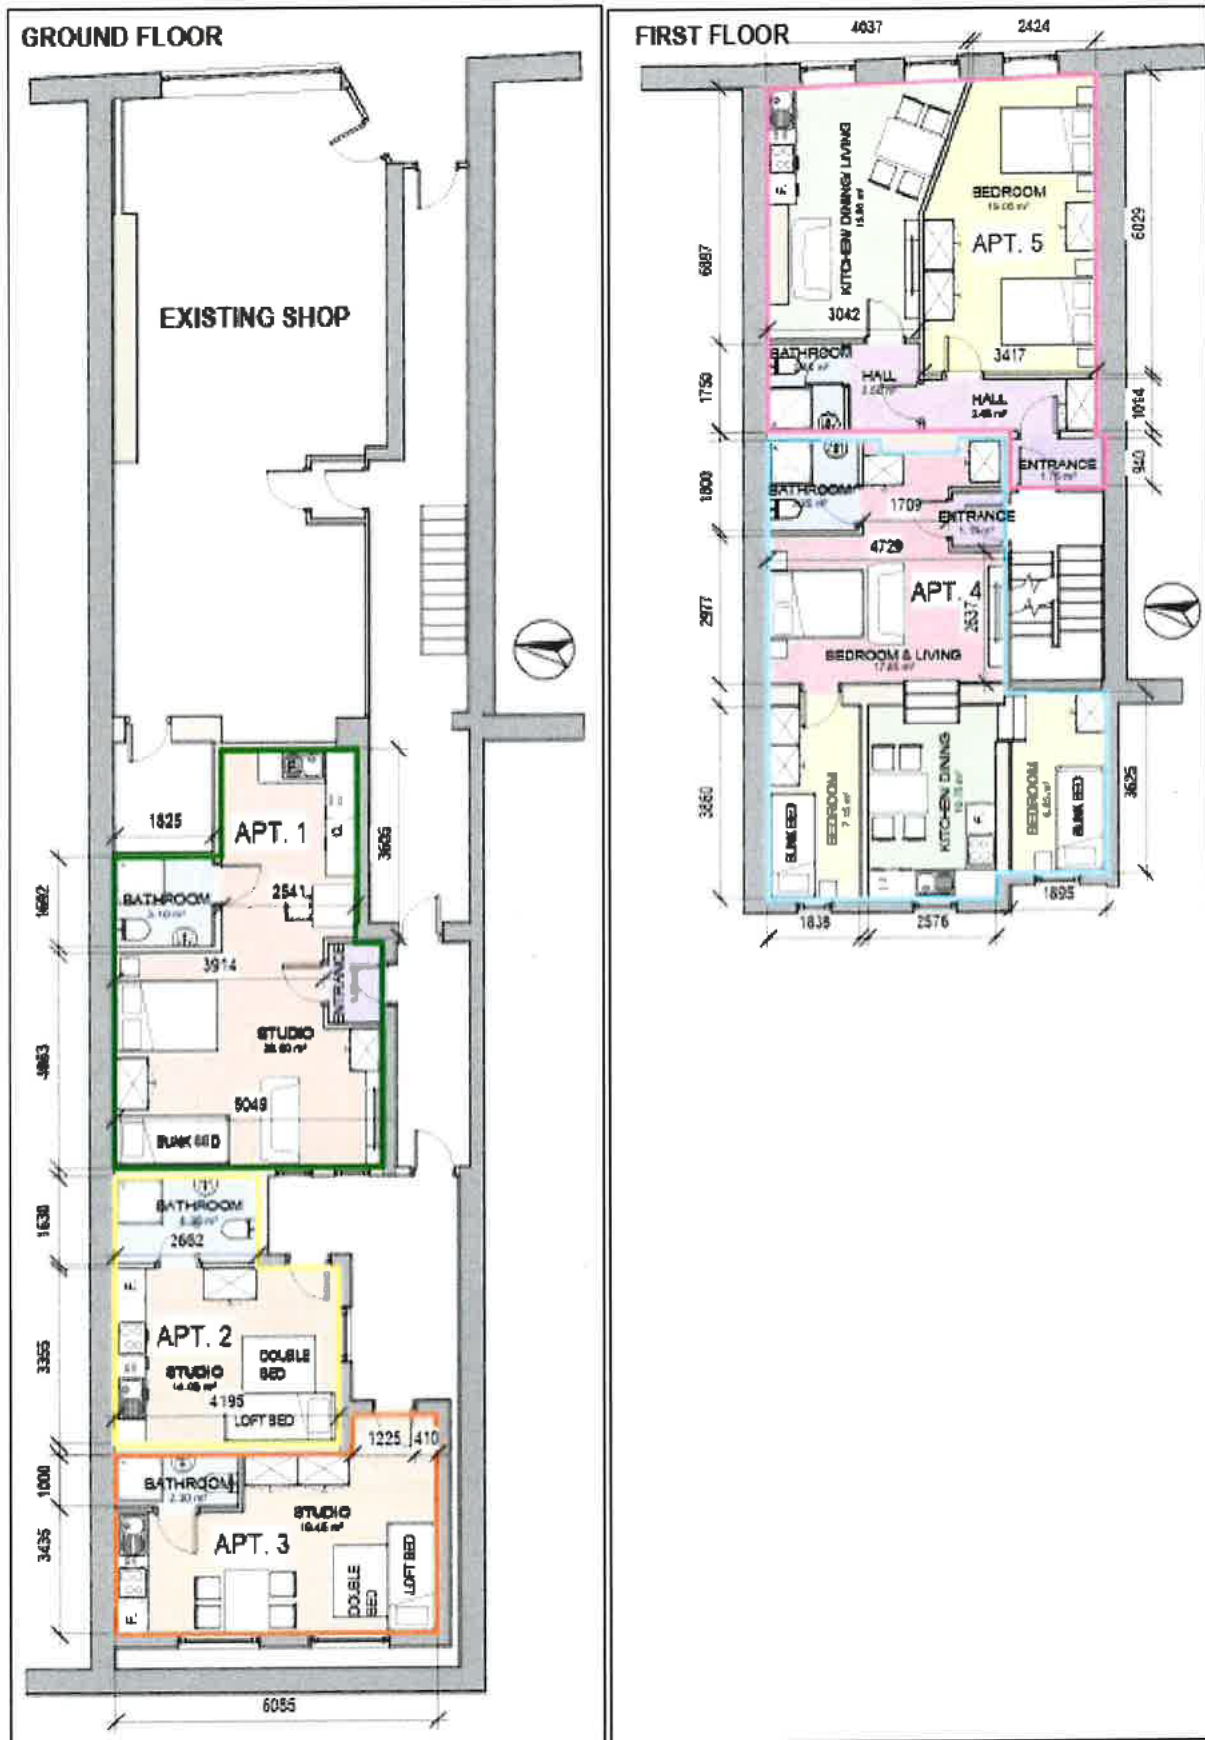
Ground Floor (L) and First Floor (R) Plans.
